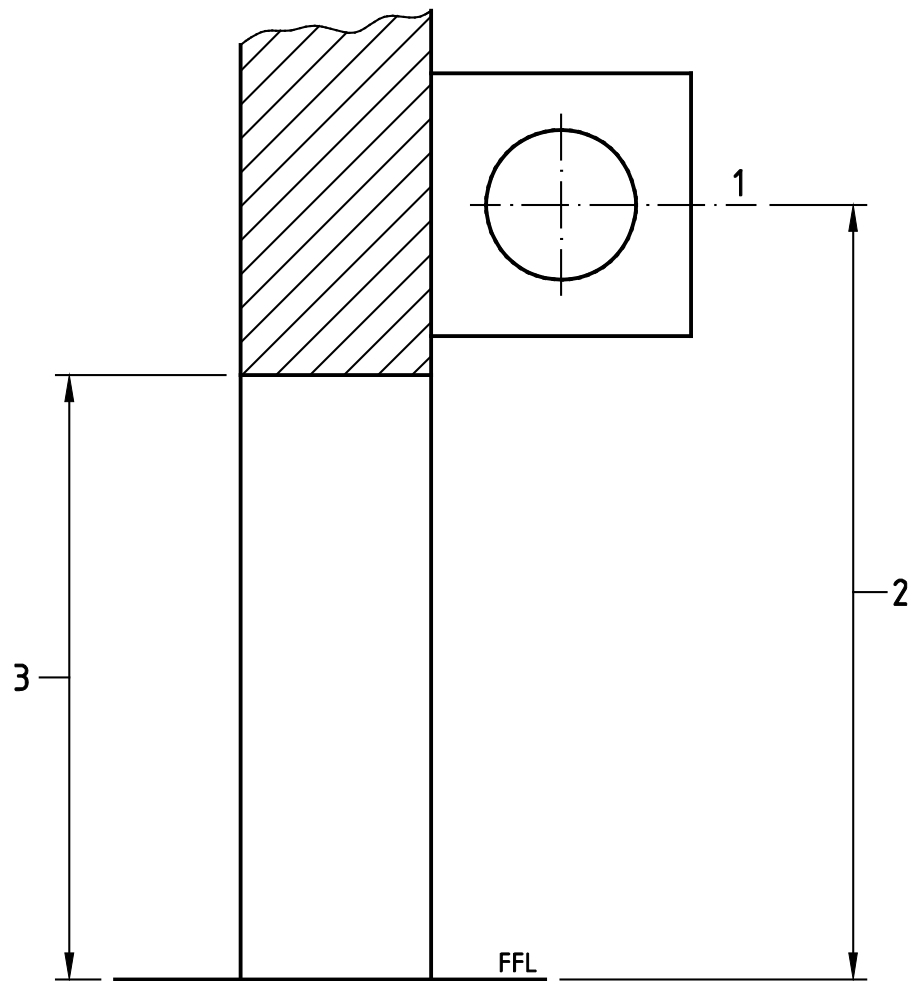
Example of a general arrangement of metal rolling shutter and curtain assembly
